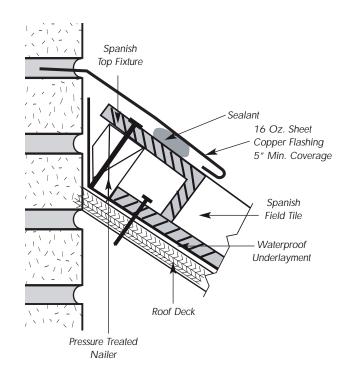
Deck Section Showing Flashing Over Top of Tiles
